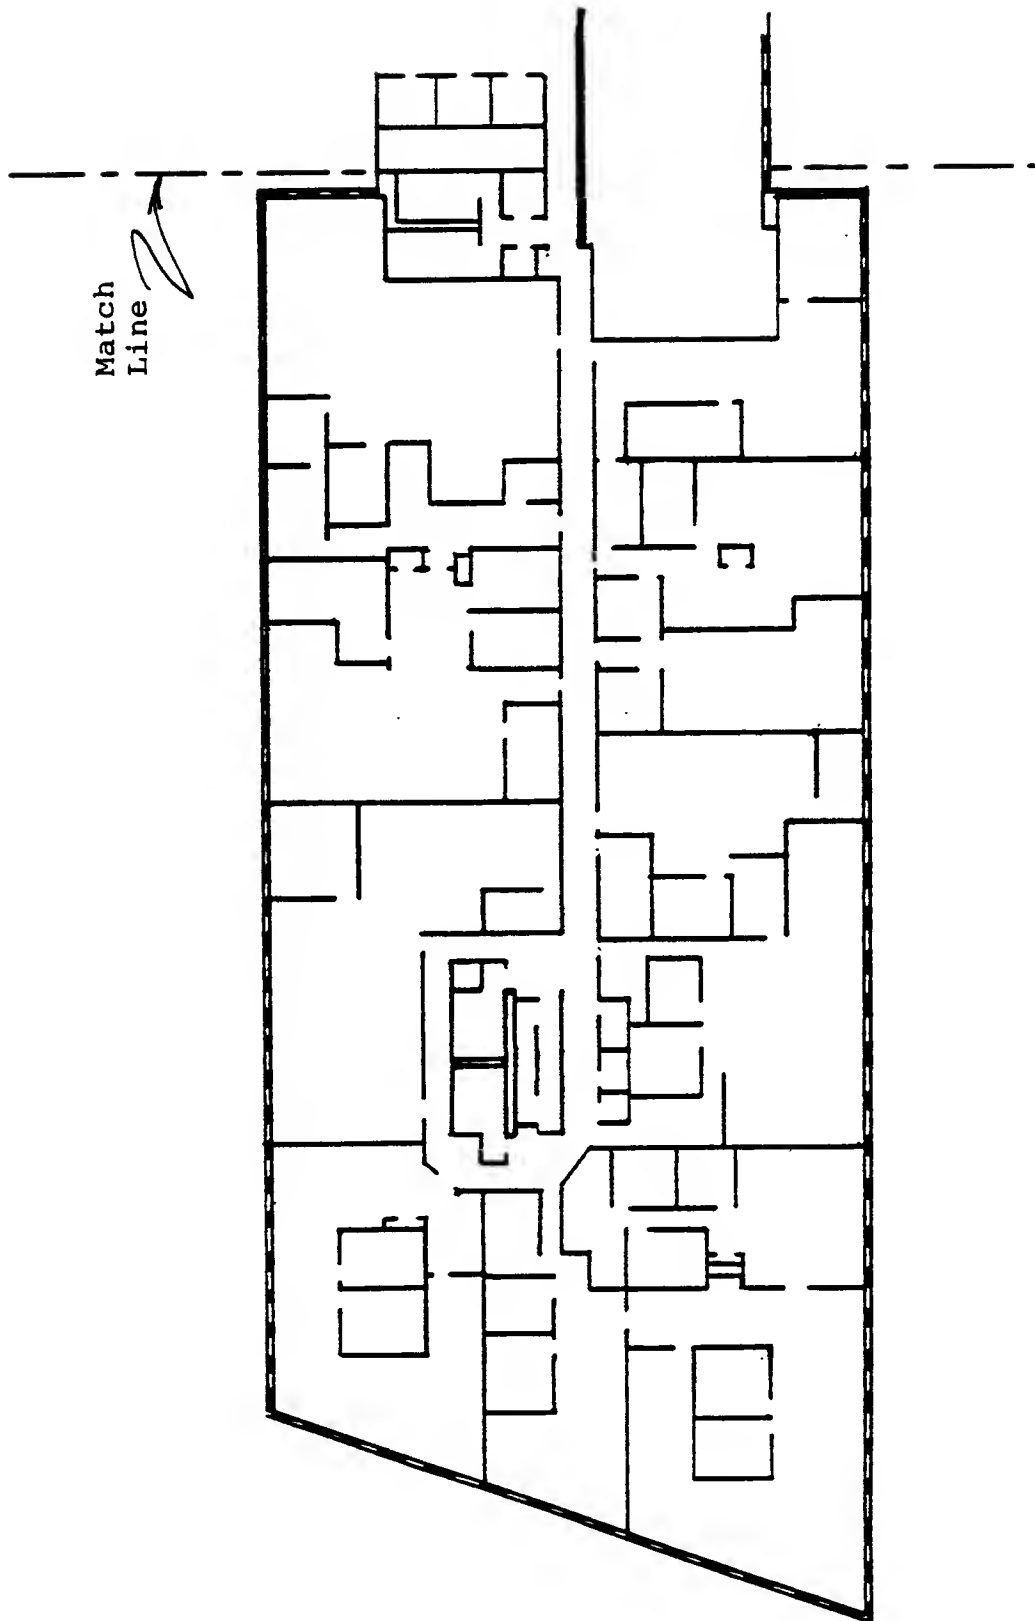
USIA BUILDING FOURTH FLOOR-SOUTH
